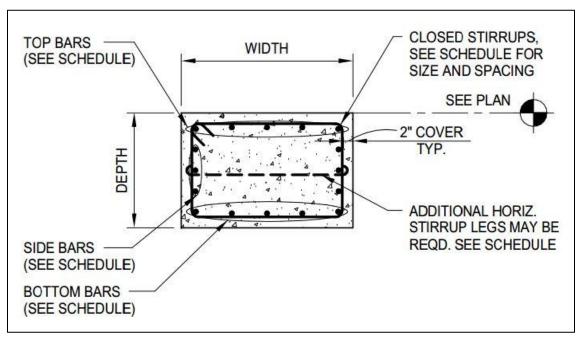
Grade Beam Rebar Detail (Courtesy of Stantec)
